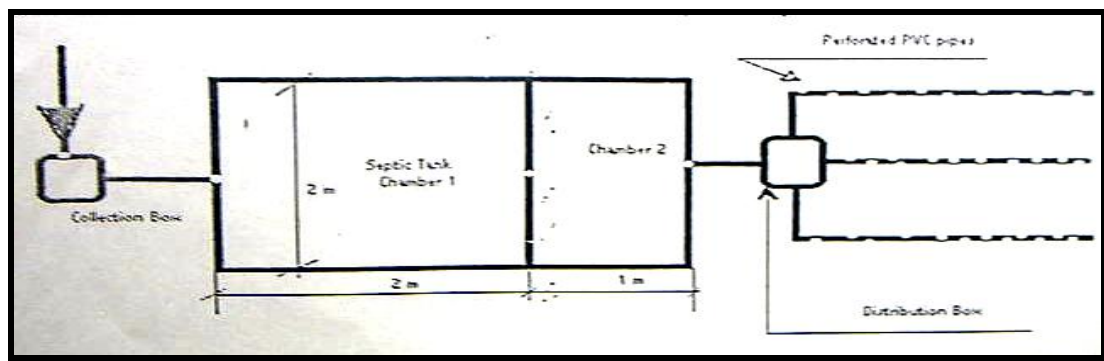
Plan view of the subsurface drainage technique (SCF, 1998)
